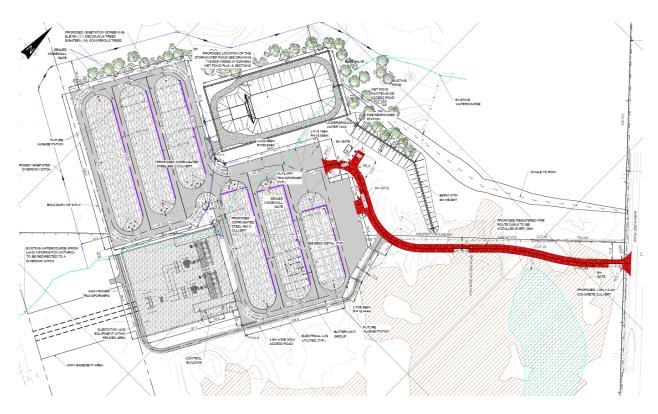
Site Plan Excerpt (BBA, dated 2025-10-07)
